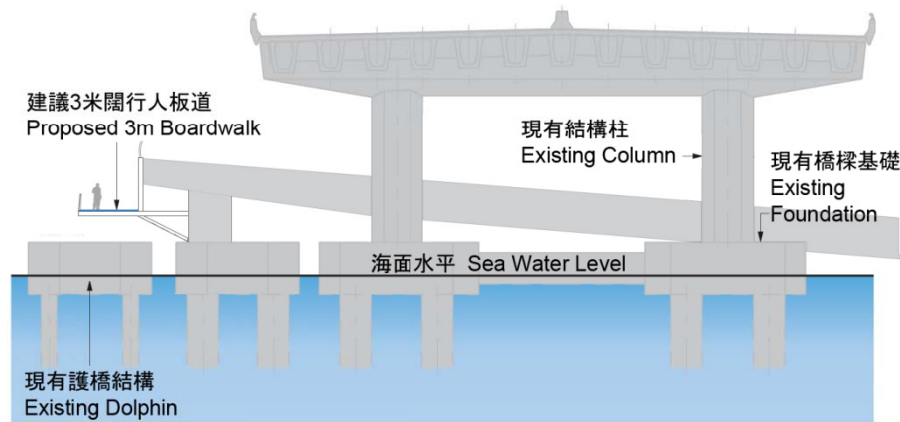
# Detailed IEC Boardwalk Alignment at Tong Shui Road Slip Road
